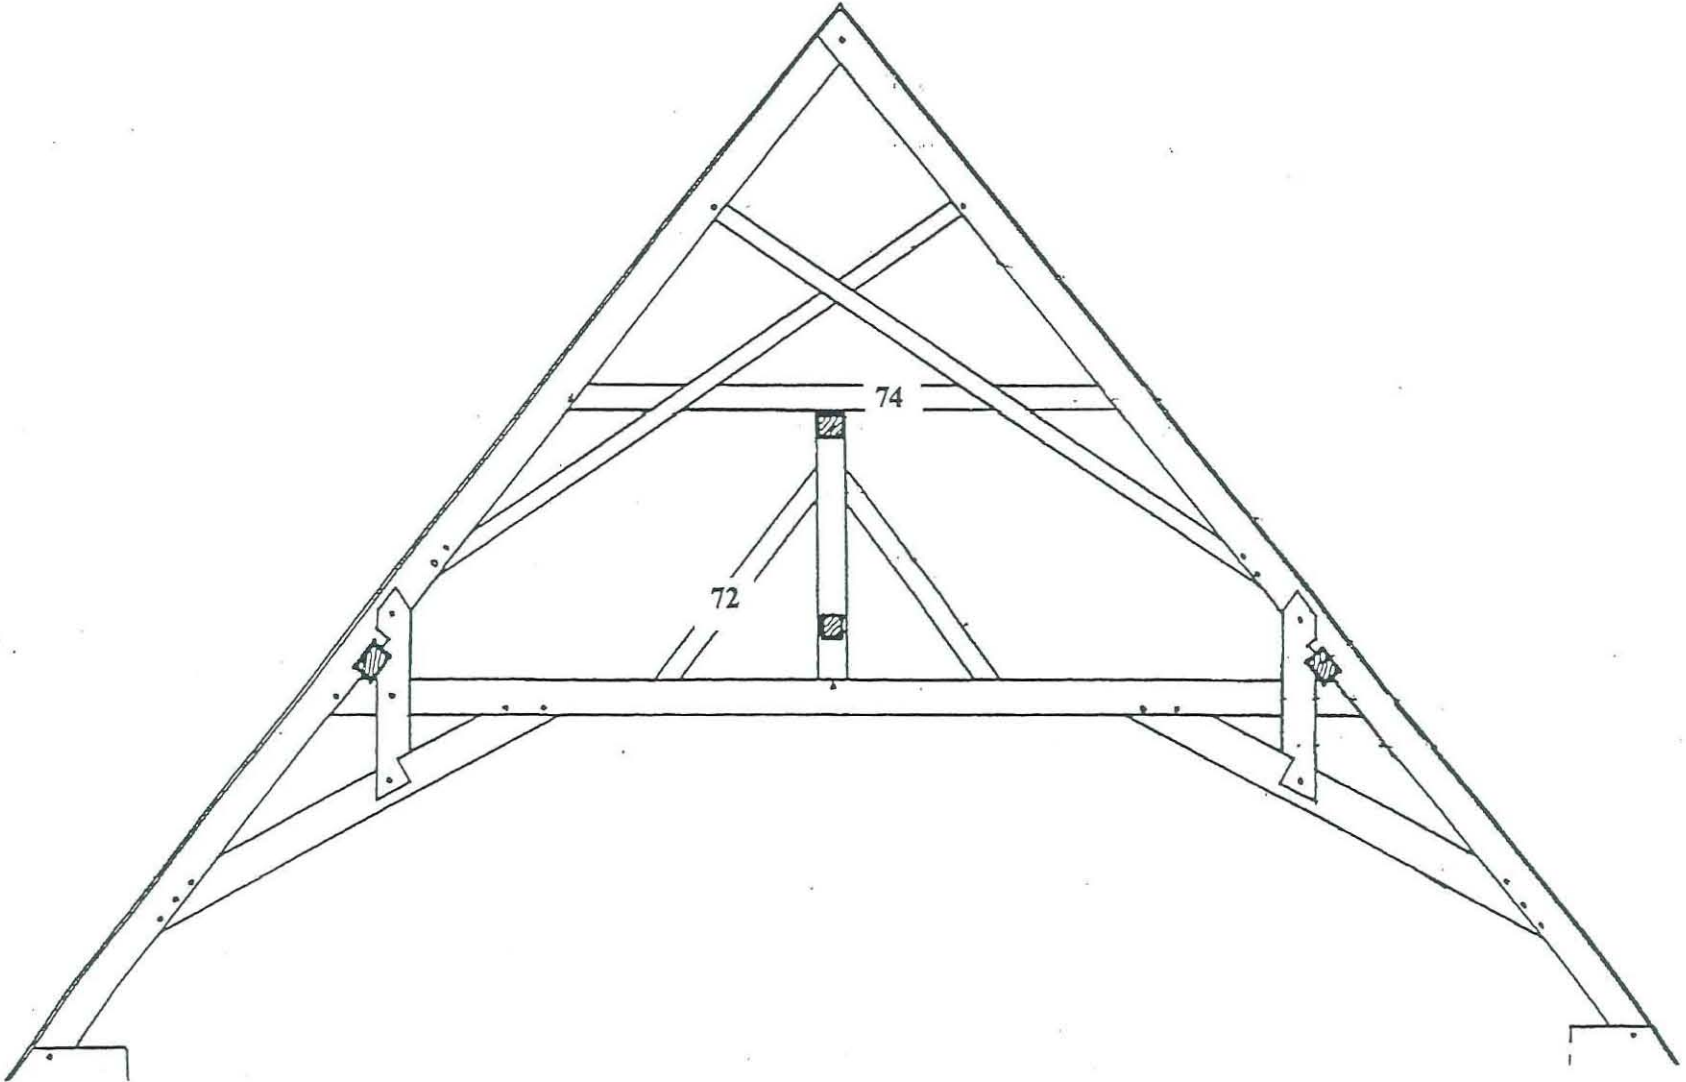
Drawing of frame 36 of the Choir and crossing, viewed from the east, to show sample locations
